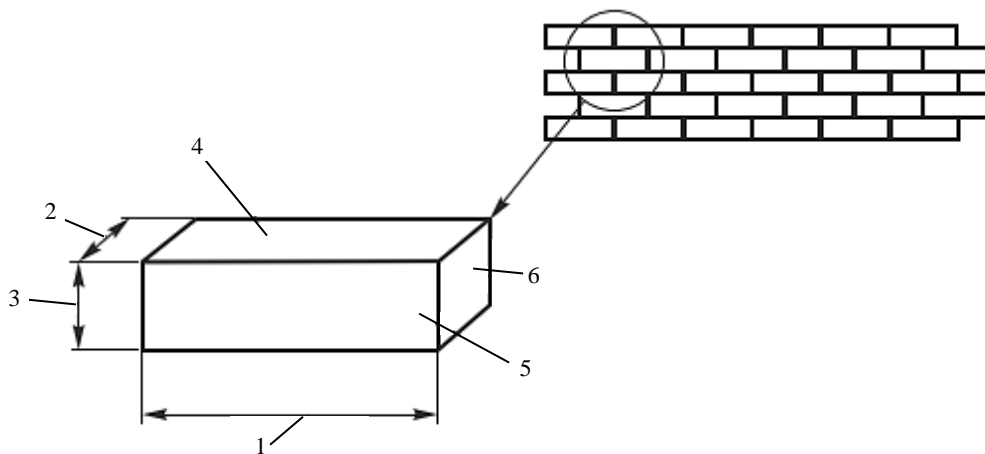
Brick dimensions and surfaces: 1 — length; 2 — width; 3 — height; 4 — support surface; 5 — front surface; 6 — end/header surface
